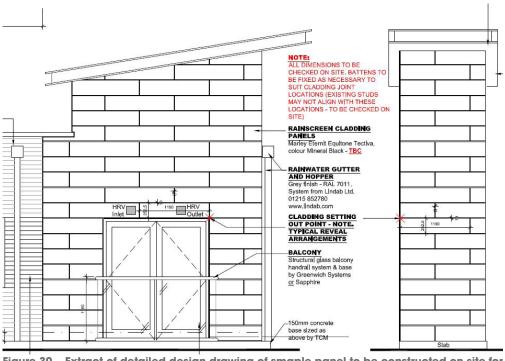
Extract of detailed design drawing of smaple panel to be constructed on site for review
